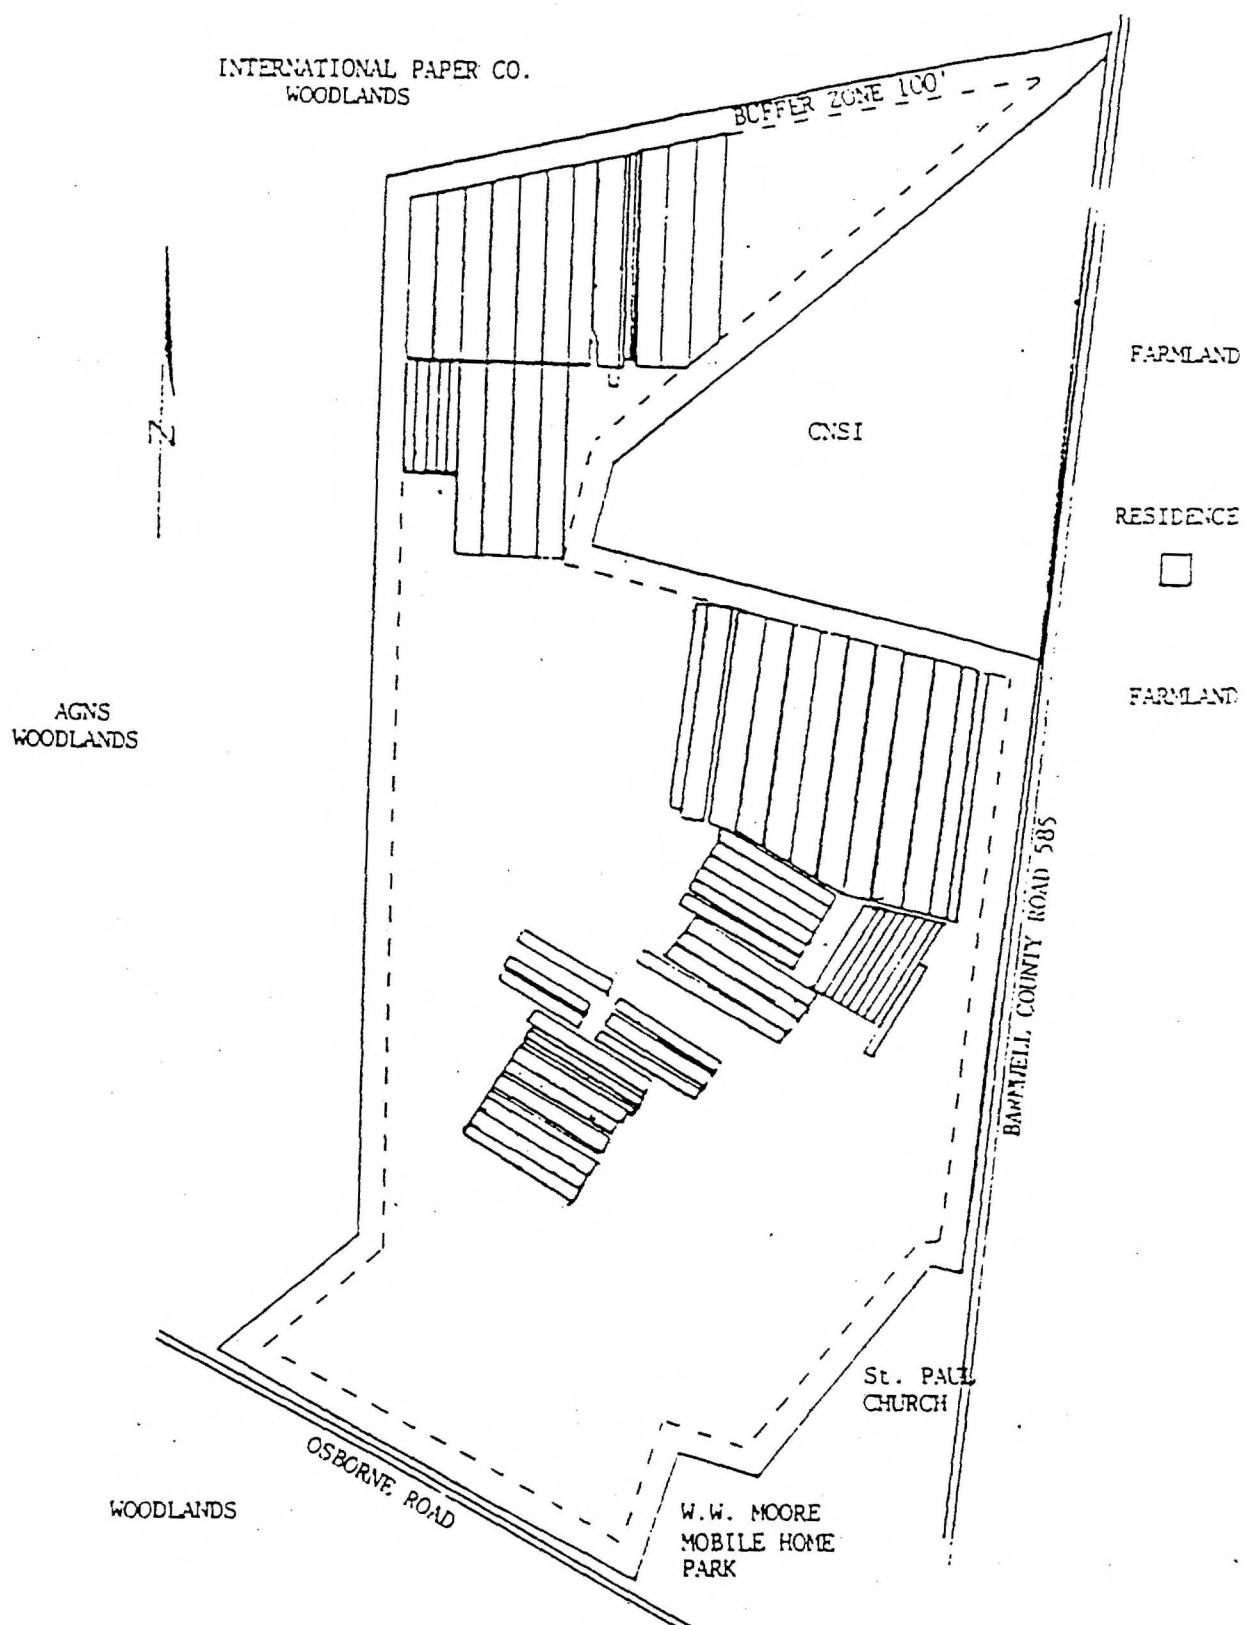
Plan view of the Barnwell site showing adjacent land owners.
